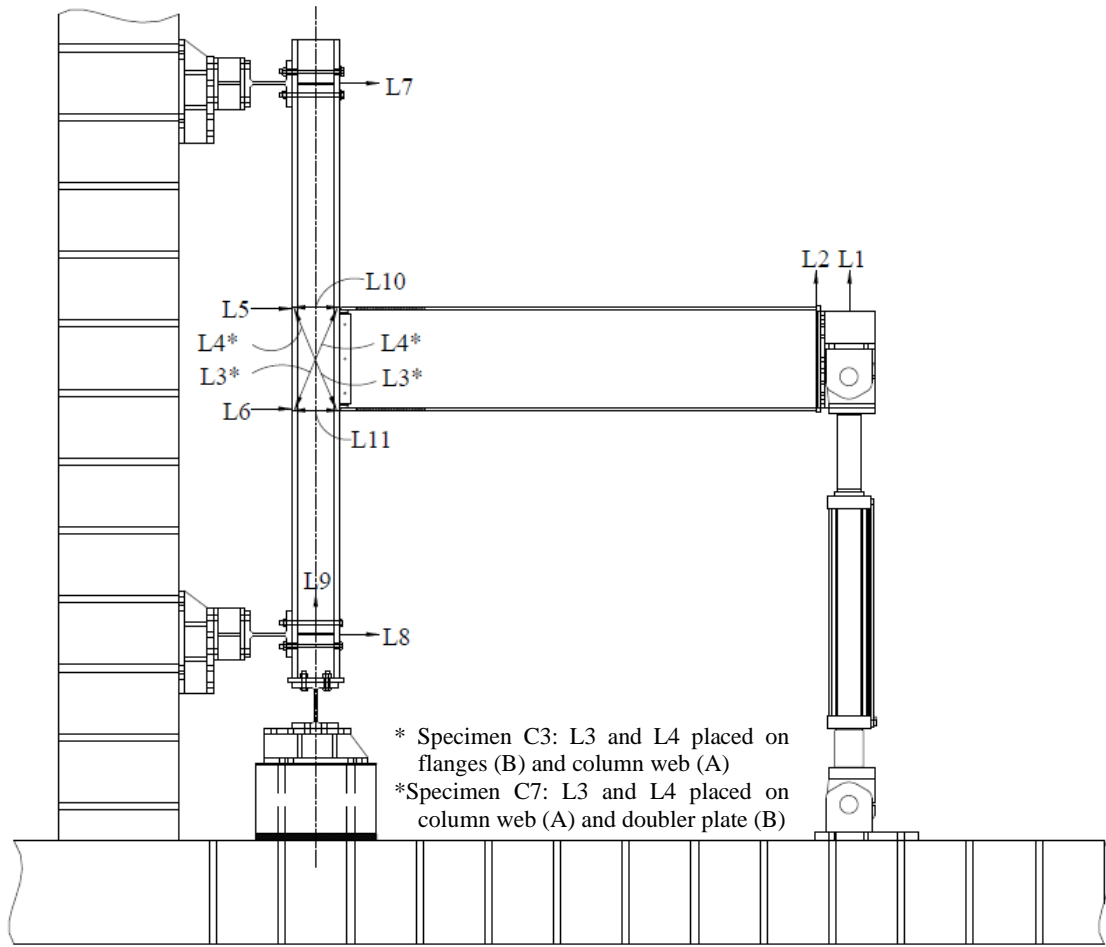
Exterior Moment Connection Transducer Layout (Specimens C3 to C7)
